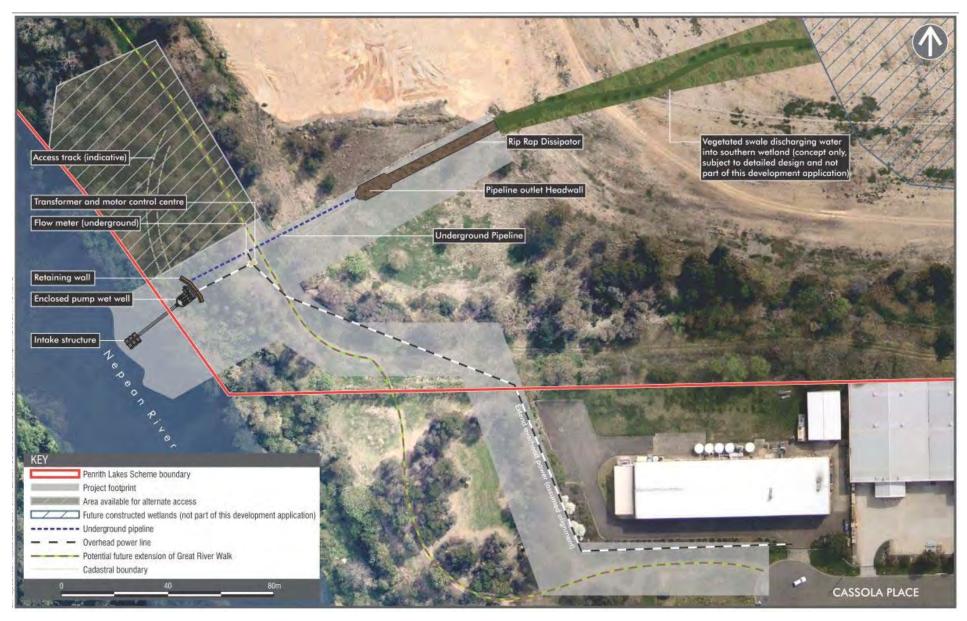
Proposed Nepean River Pump and Pipeline plan
